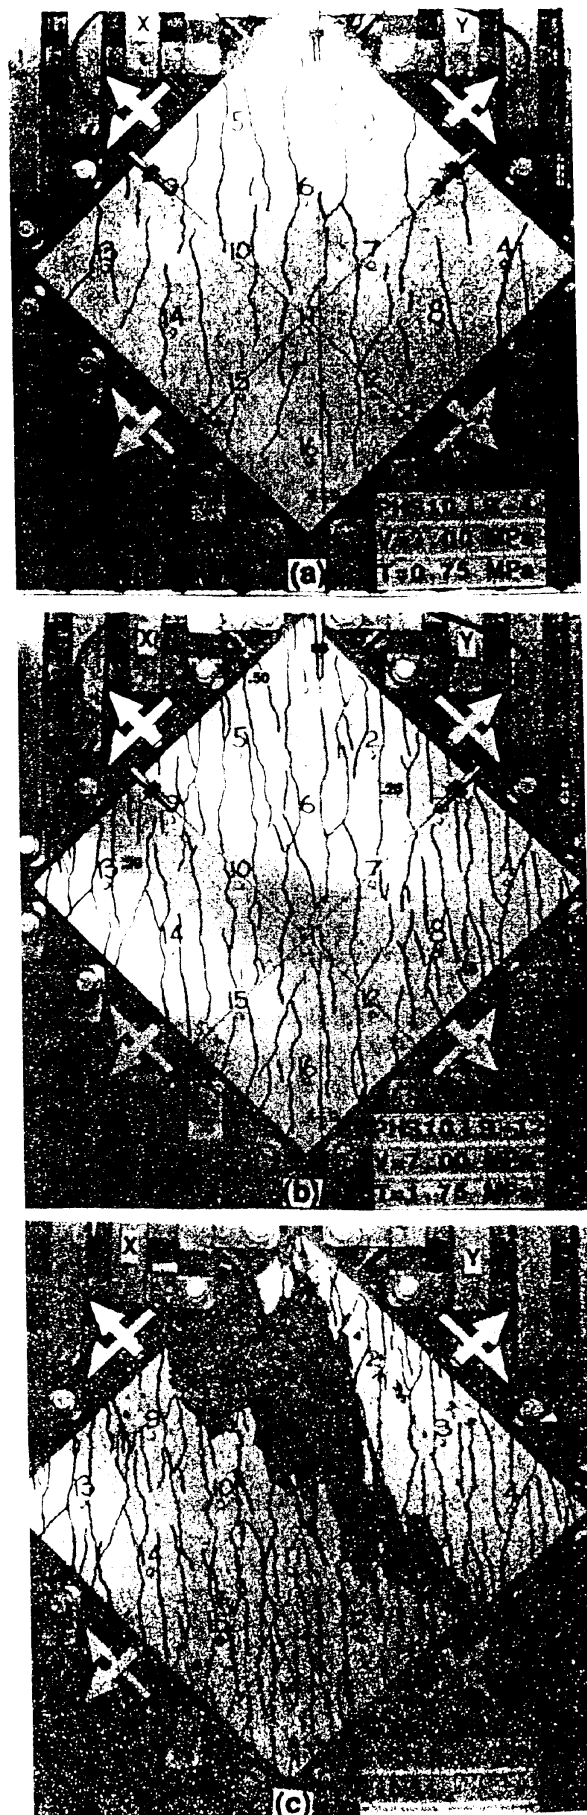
Photos of Panel PHS10 during testing: (a) after cracking; (b) after yielding of transverse reinforcement; (c) after shear failure of concrete
